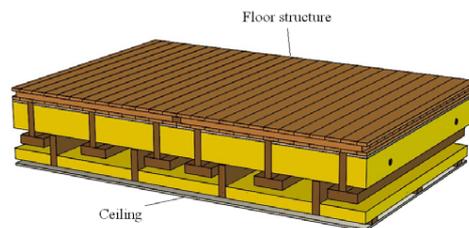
floor element, floor structure and ceiling, made by Martinsons Byggsystem AB.
